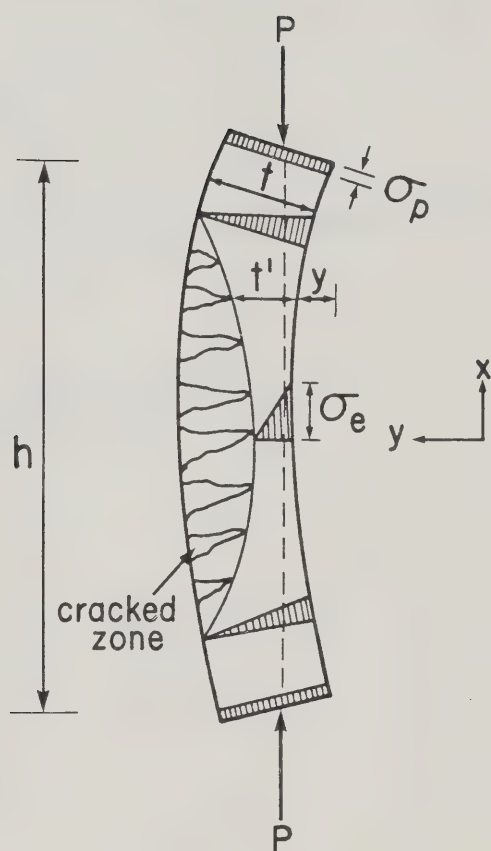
Deflected Shape of Eccentrically Loaded Wall
